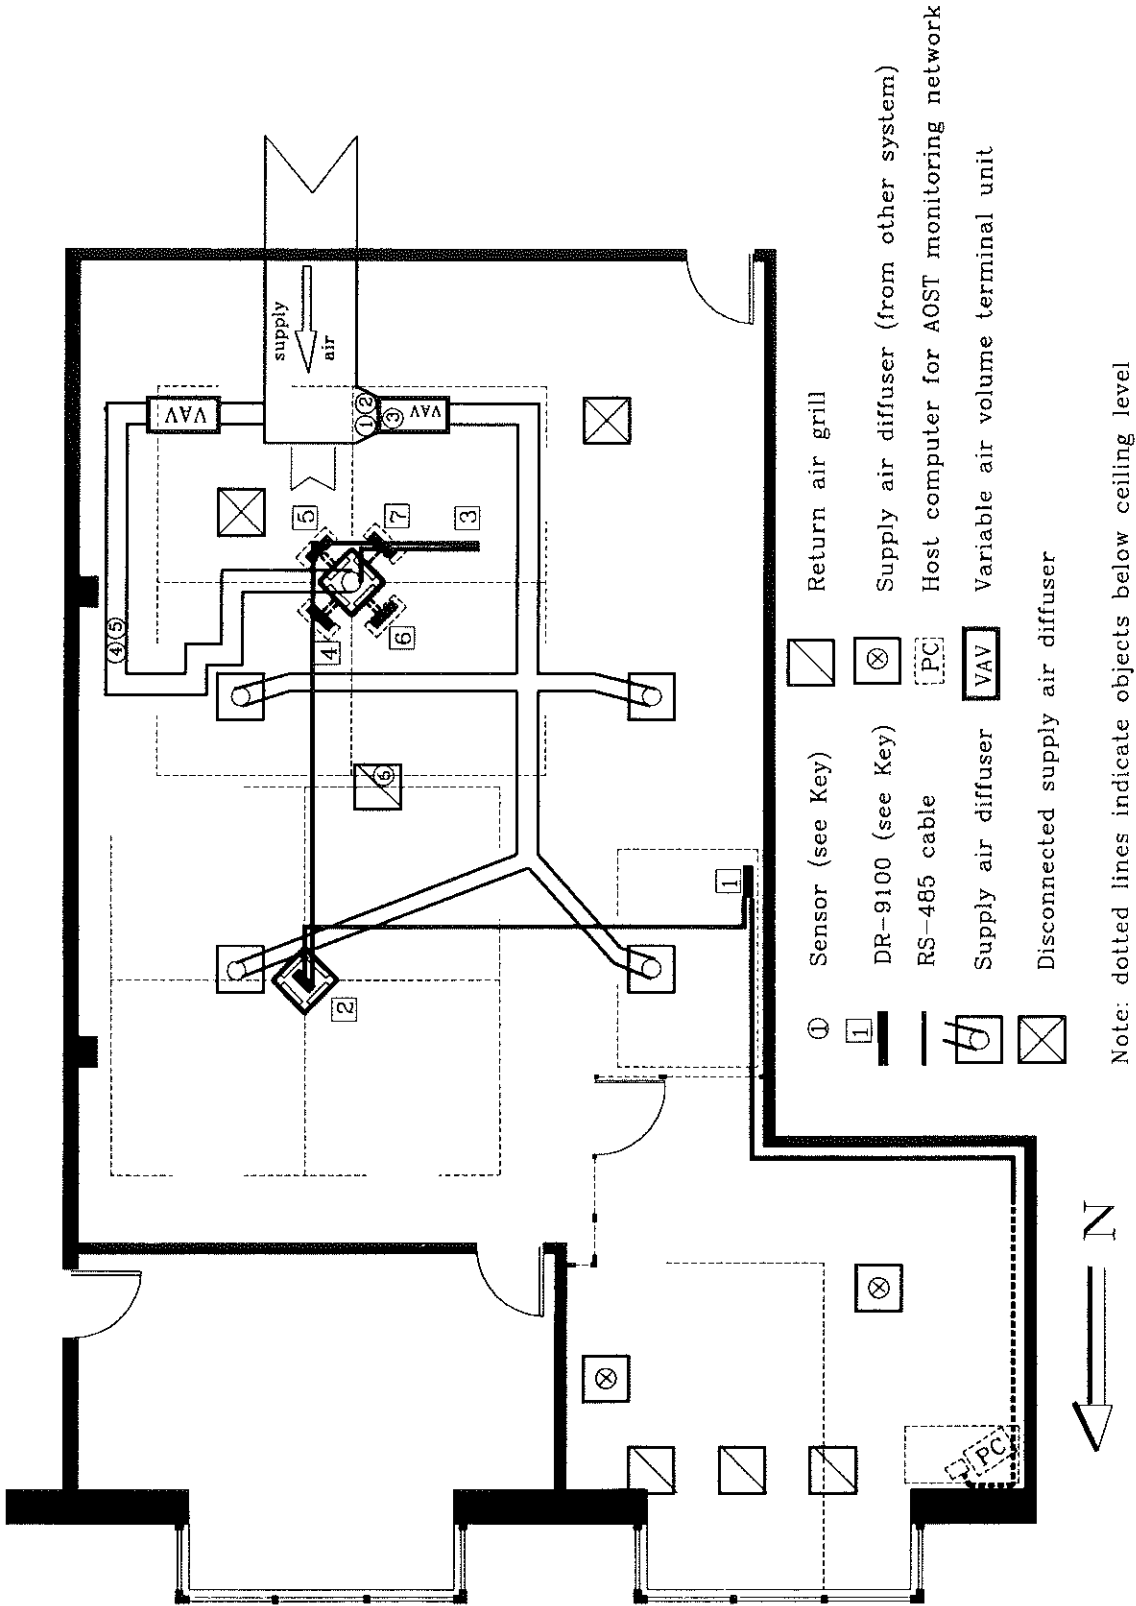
Advanced Office Systems Testbed: Ceiling Plenum Plan
